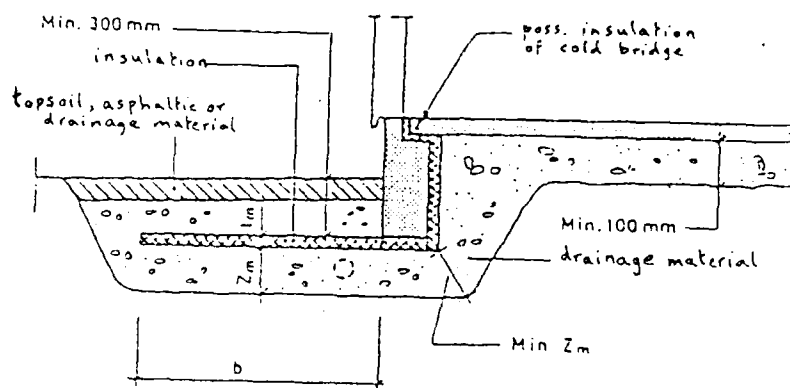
Frost protection of the floor can be omitted if the inside temperature stays above  $0^{\circ}\text{C}$ . It would be necessary to break the cold bridge between the foundation wall and the foundation.
